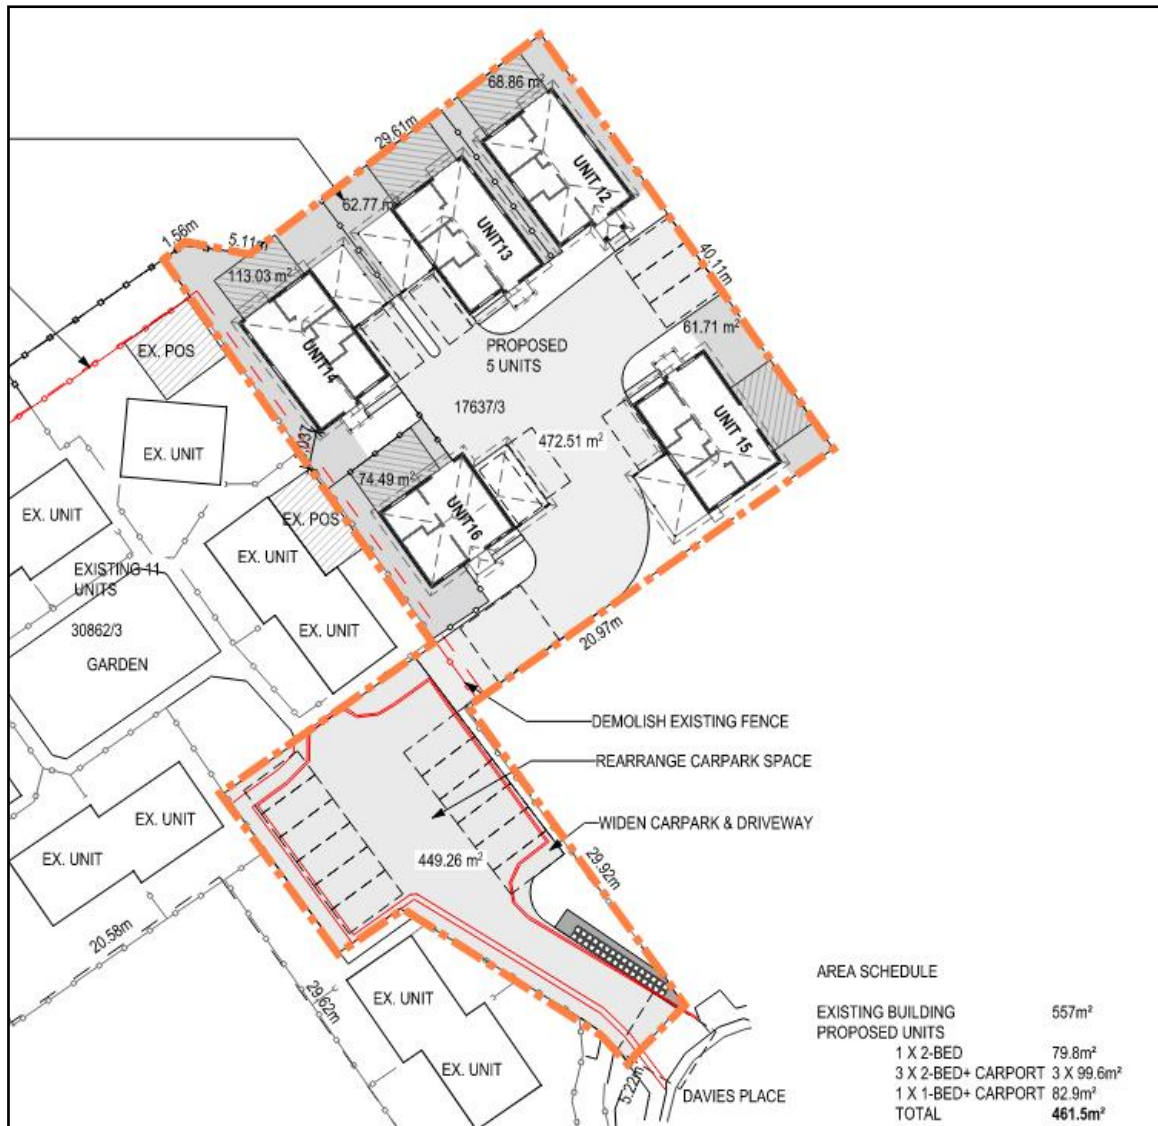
excerpt of the submitted Site Plan showing the location and configuration of the proposed development within the site.
